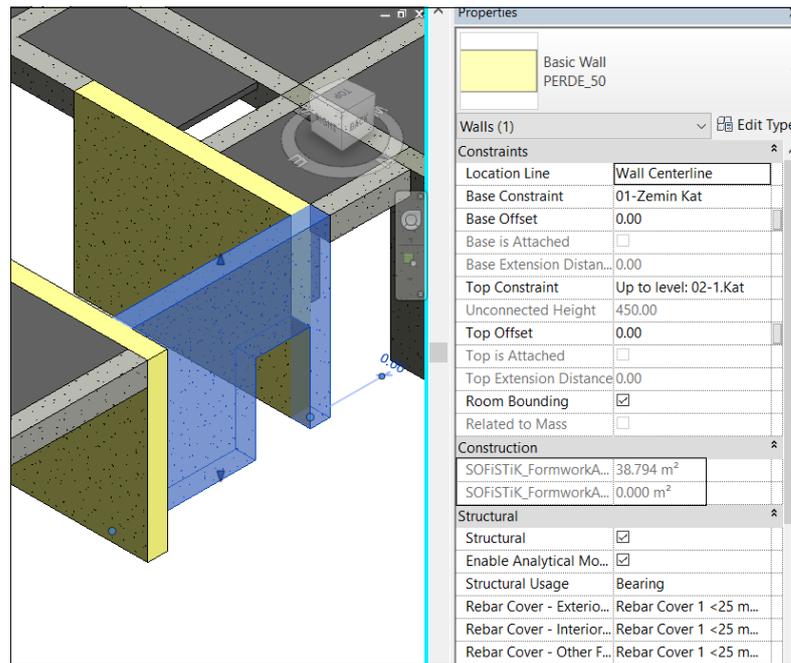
Miscalculated Formwork Area of Structural Wall in Revit Model
